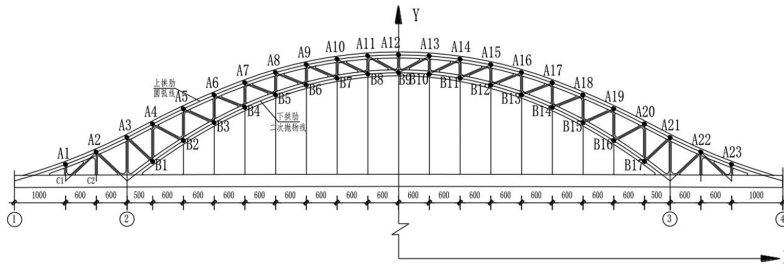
Longitudinal section diagram of the construction elevation of the arch rib nodes
